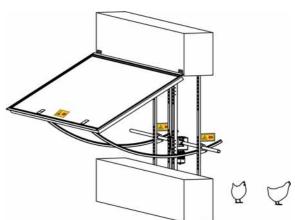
Tunnel door with joint on top - opening towards the outside of the house
